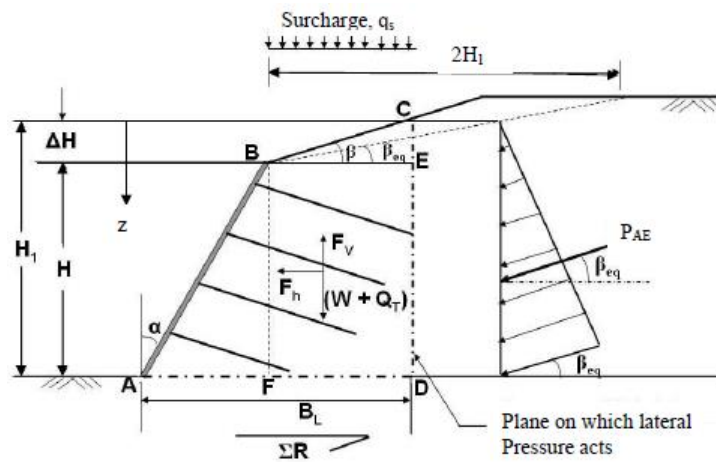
14: Sliding stability of a soil-nail wall [3]
